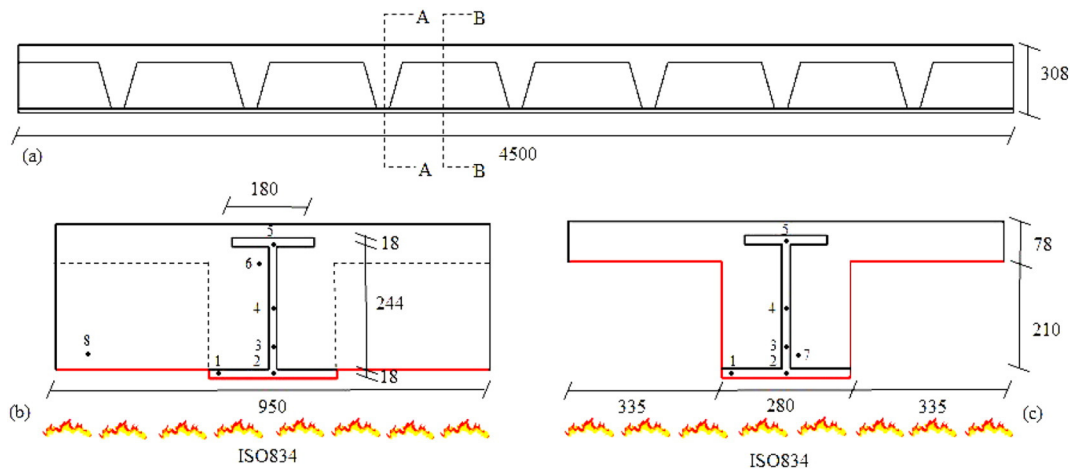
Test Assembly WFRC 66162, (a) Elevation; (b) Section at A-A; (c) Section at B-B.
